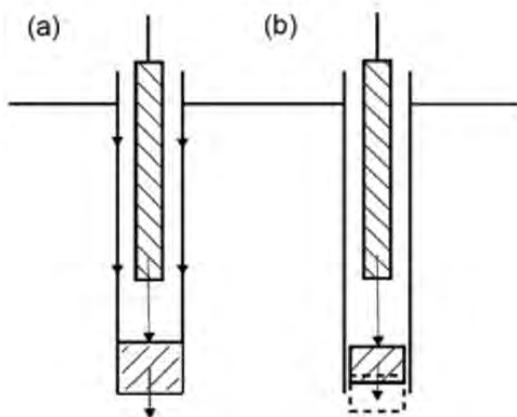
Pile bottom-driving methods: a) Gravel, dry concrete or cast insitu concrete plug; the force from impact of the falling hammer is transferred to the inside of the casing and casing is dragged downwards with the plug. b) Precast concrete plug; only the plug is driven downwards by impact of the falling hammer, the casing remains stationary. The plug is set above the toe of the casing and then driven beyond it.
